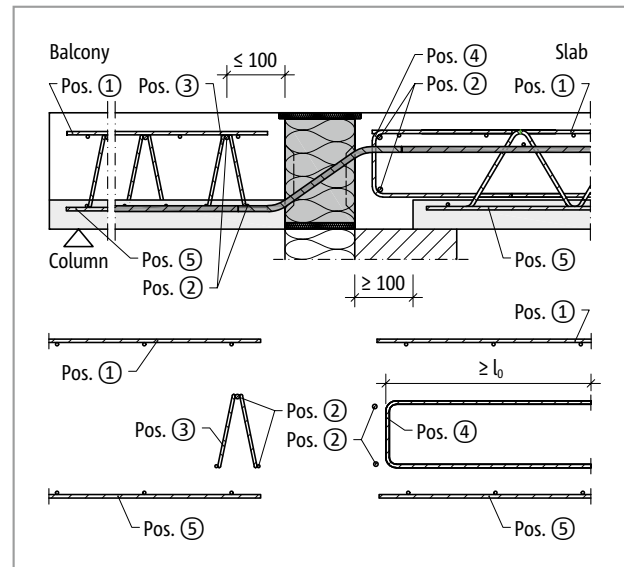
Schöck Isokorb® XT type Q-V5 to V11: On-site reinforcement with lattice beam
